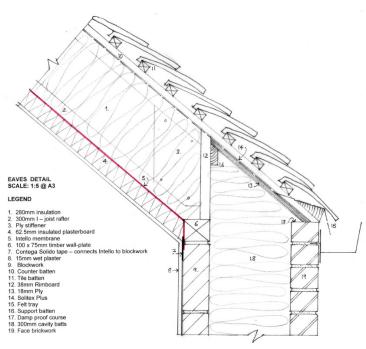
Roof to external wall junction. Drawing by Lacey Interior Architecture Ltd.
